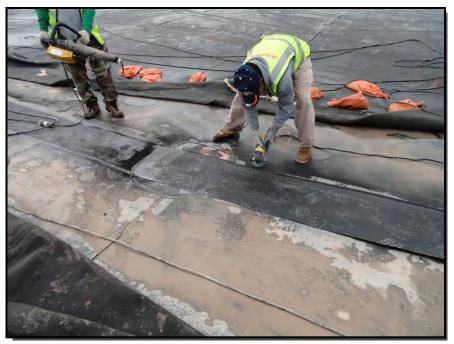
Seams between adjacent geomembrane panels were constructed using fusion welding equipment.
